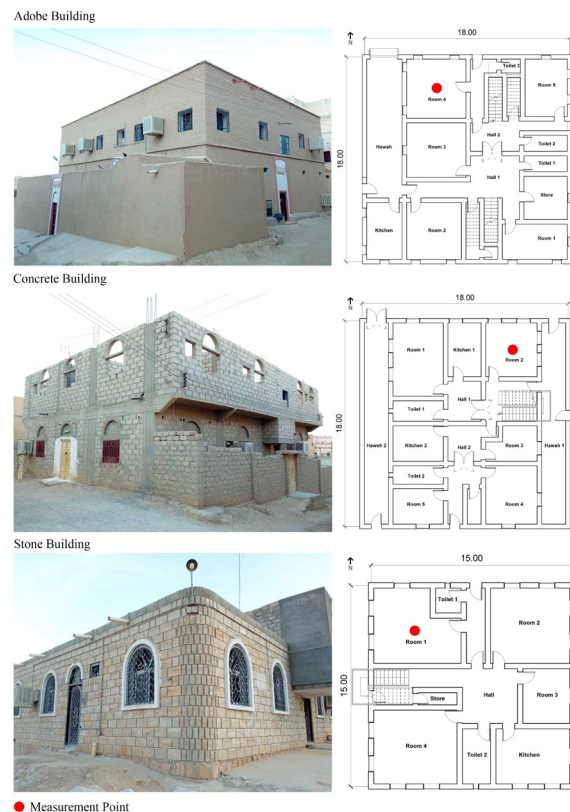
footages of the local houses in which the field measurements were conducted in addition to ground floor plans and locations of the measurement points within the plans
